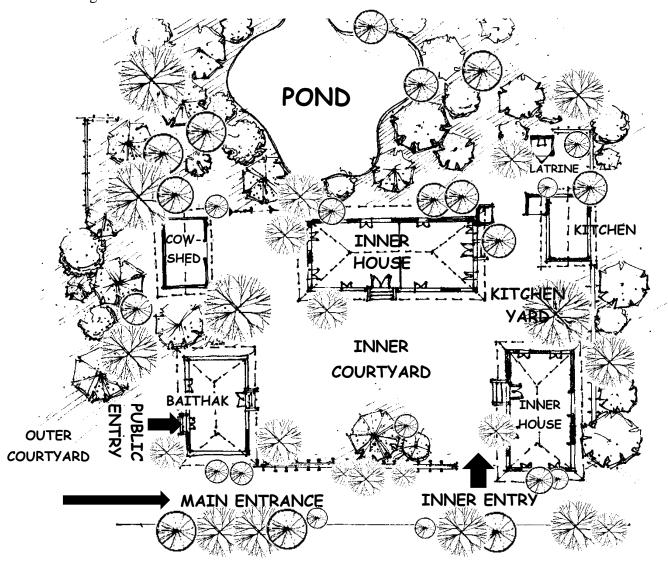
Plan of a traditional house form in rural Bangladesh (Hasan, 1985)
